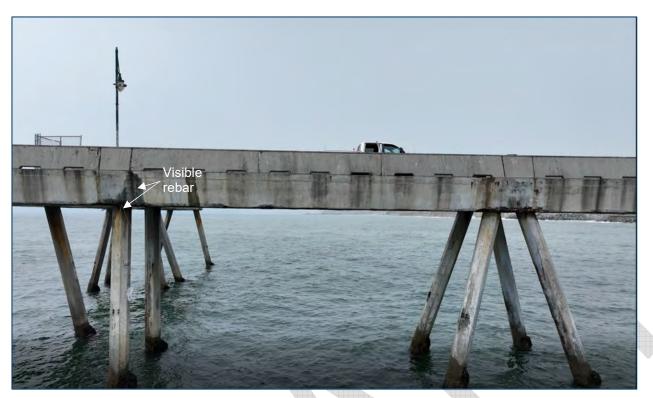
Deck Exterior between Bent 1Q and 1P – South Face
